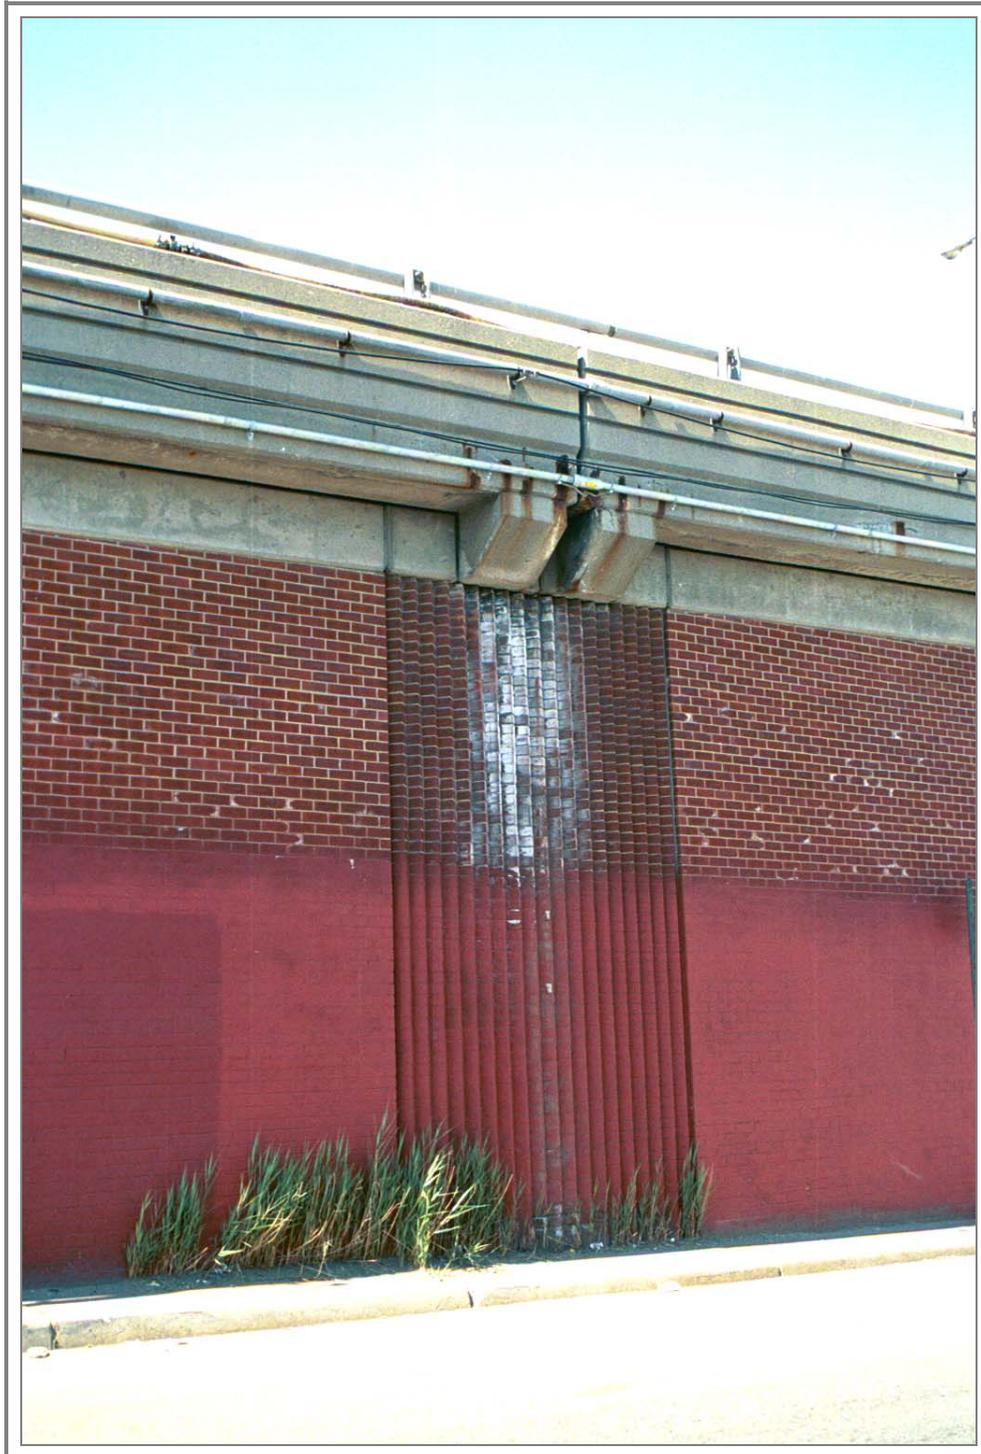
Detail of sawtooth brick elements on exterior of bridge abutments, on the Brooklyn side
